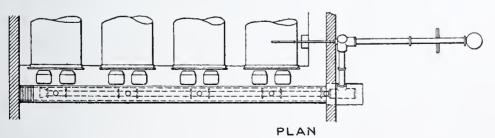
THE BENNIS STEAM SUCTION ASH CONVEYOR, AS ARRANGED TO DISCHARGE ON A HEAP OUTSIDE THE BOILER HOUSE.
